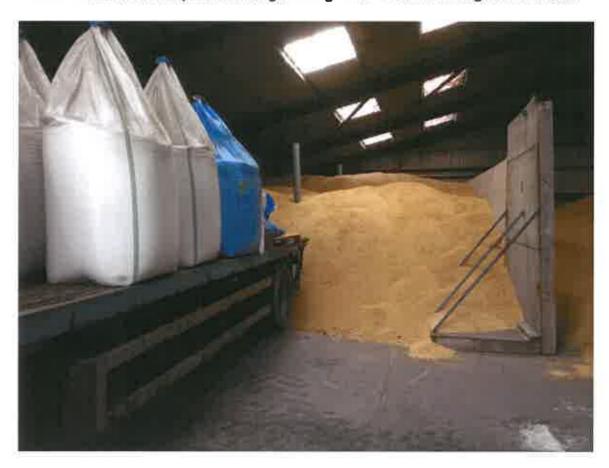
General Purpose Building. This photo also shows the wall that will be the kitchen/living room wall for the dwelling house in Plot 1 in the proposed development.
